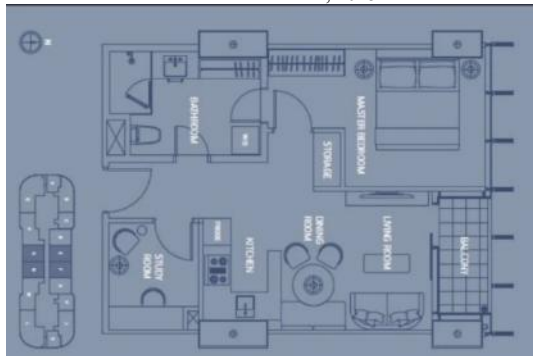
Floor Plan of Mixed-Use SQ Residence Apartment
